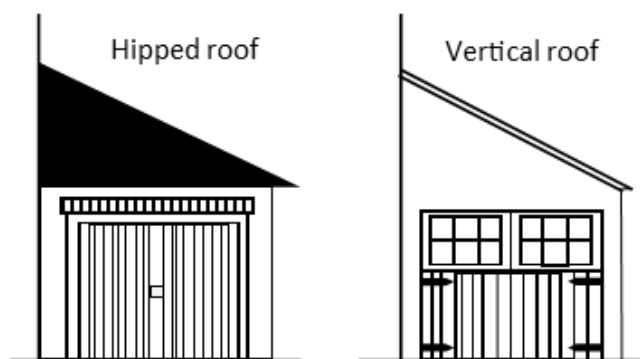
Lean-to roofs are considered the best option for a garage side extension, as shown these may be hipped or vertical.
